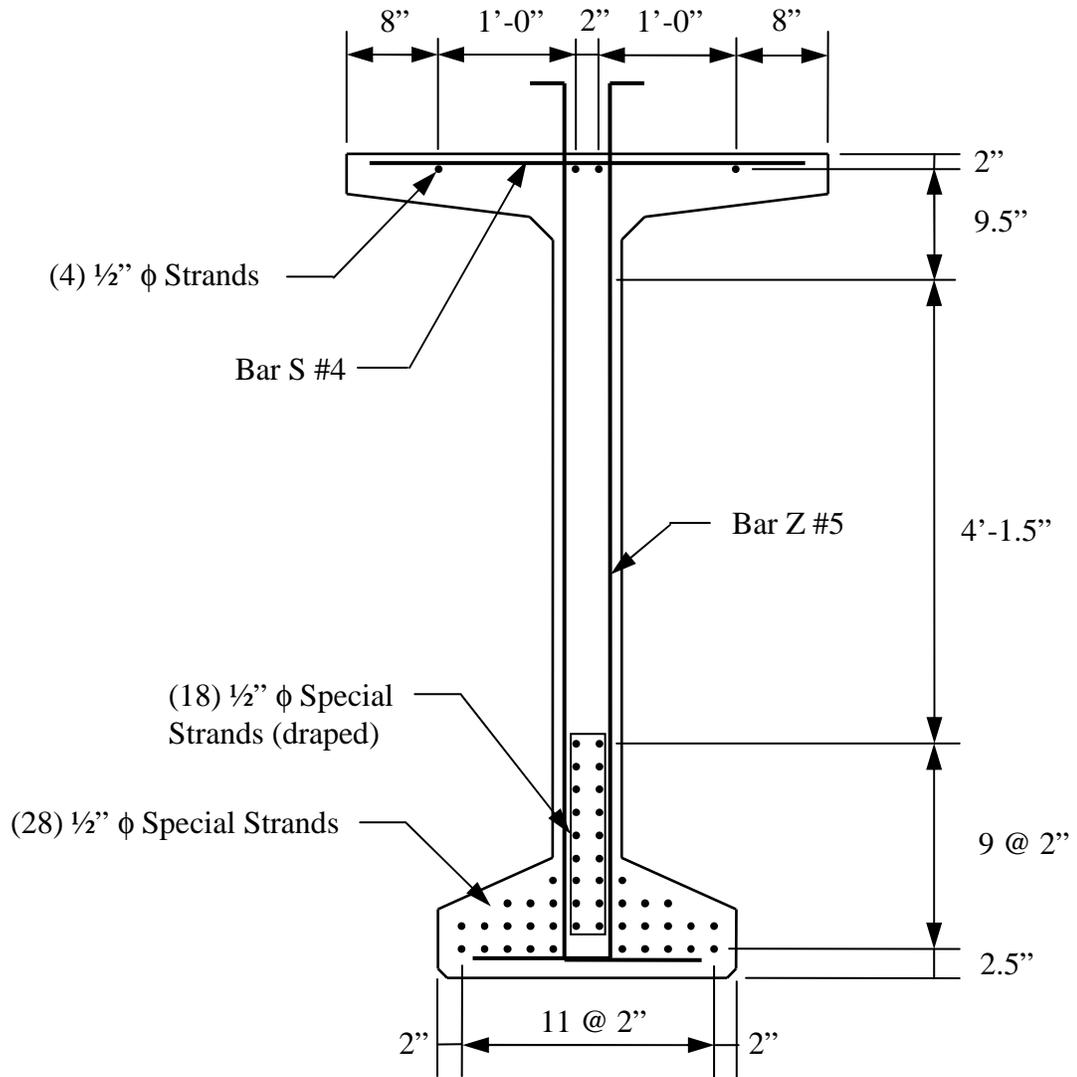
Mild Steel and Strand Arrangement for BT-72 Girder at Midspan
